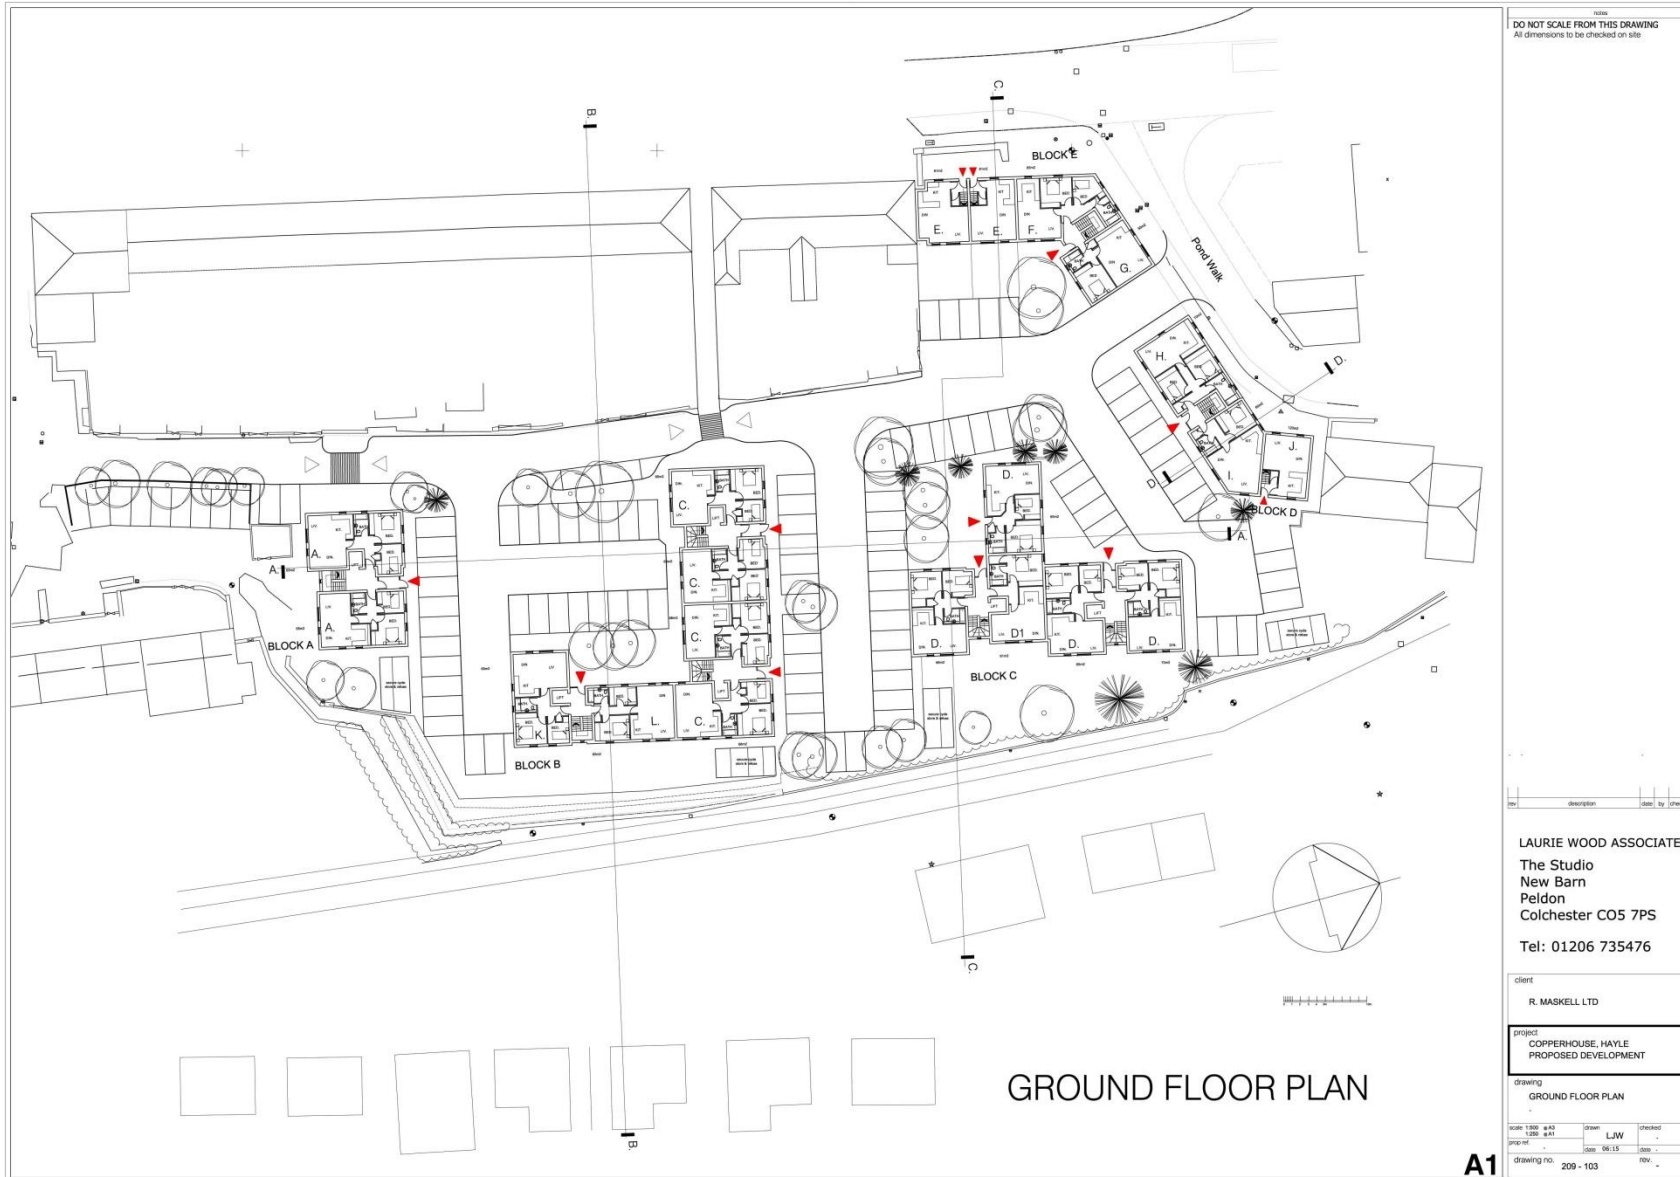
Proposed ground floor plan (Laurie Wood Associates).
